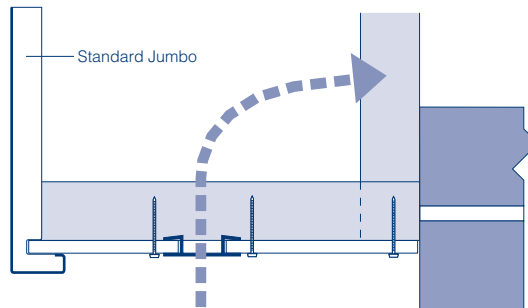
C237 strip vent (10 mm) or C238 (25 mm) fitted between soffit boards
